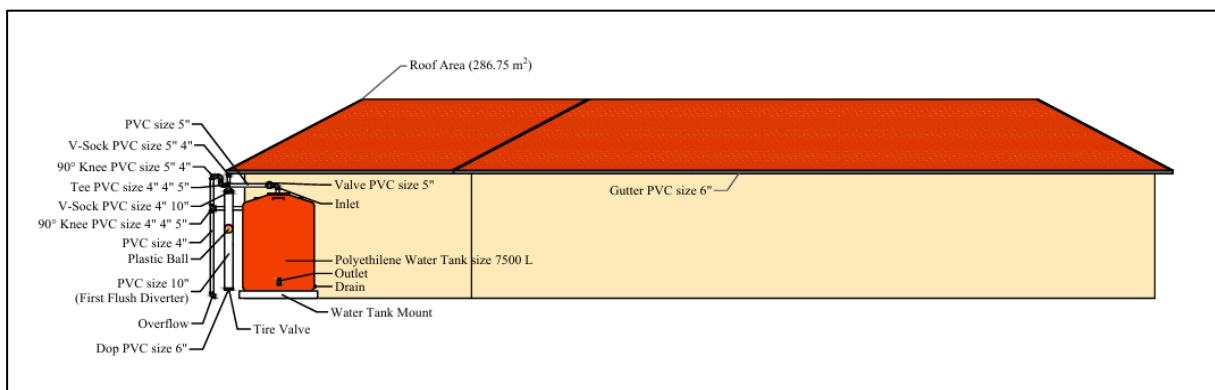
Details of Rainwater Harvesting Design at the Wonosari Village Office
